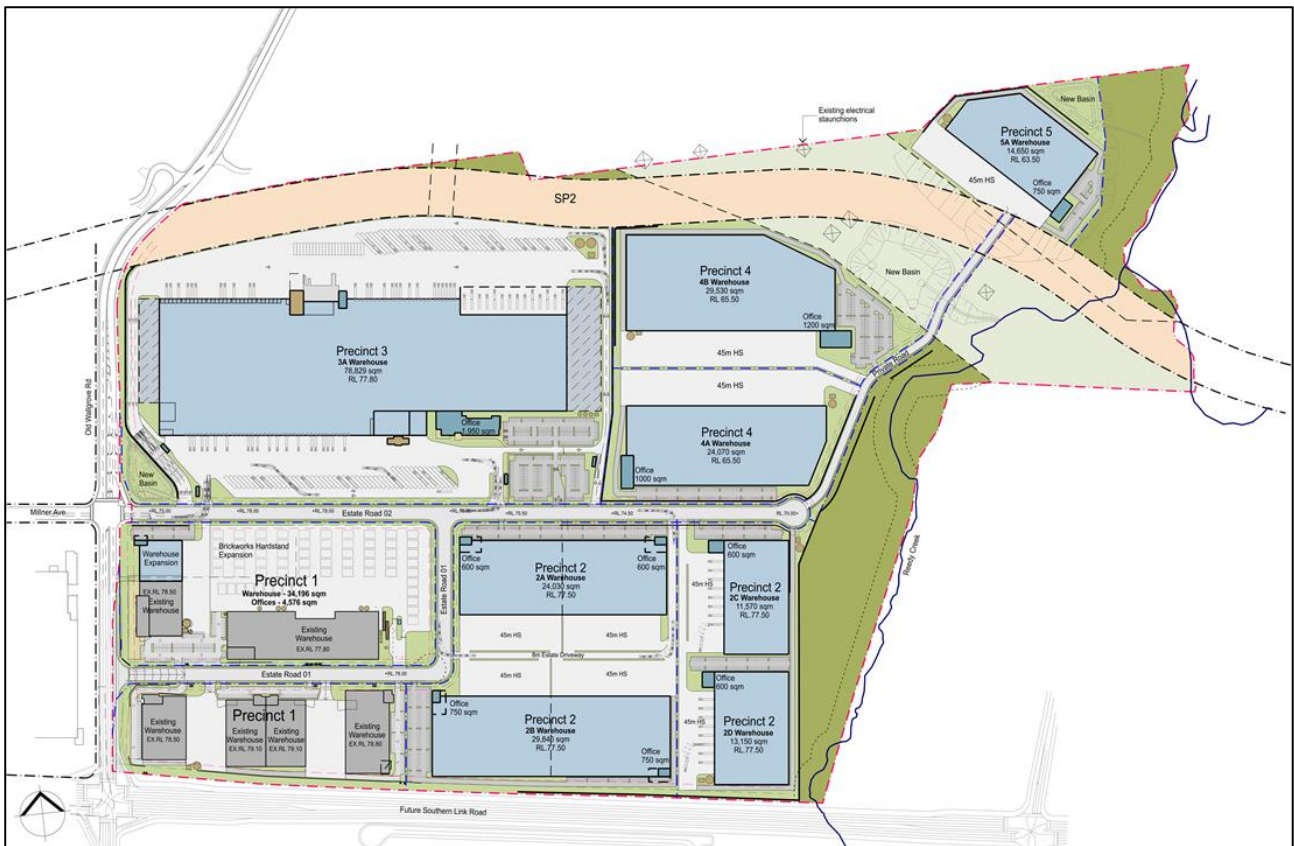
Proposed Southern Link Road Network and Alignment with Respect to the Site Plan (Source: SBA Architects)
